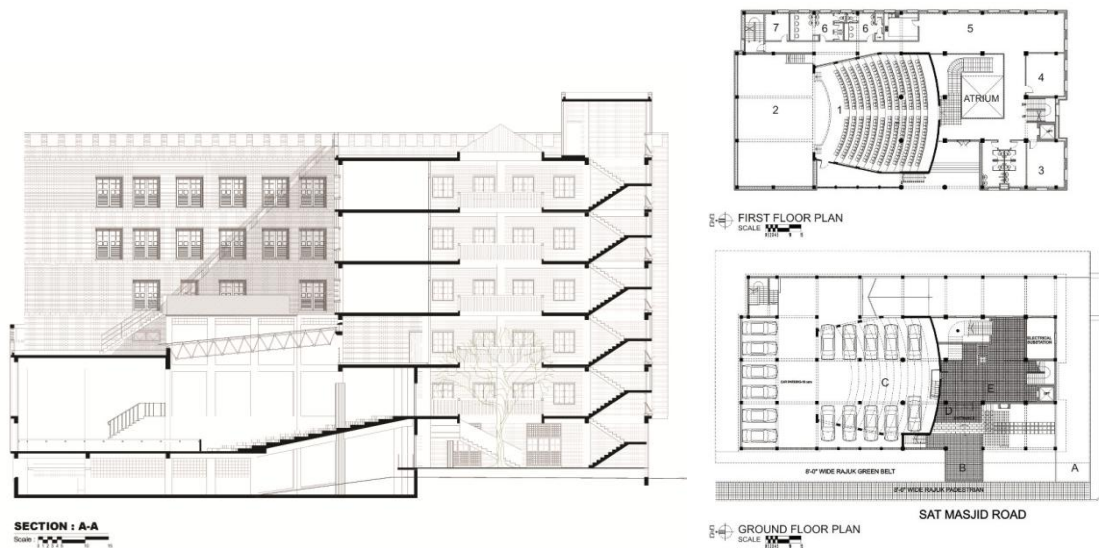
\_ Plan and Section (source: Architects of Bangladesh)
